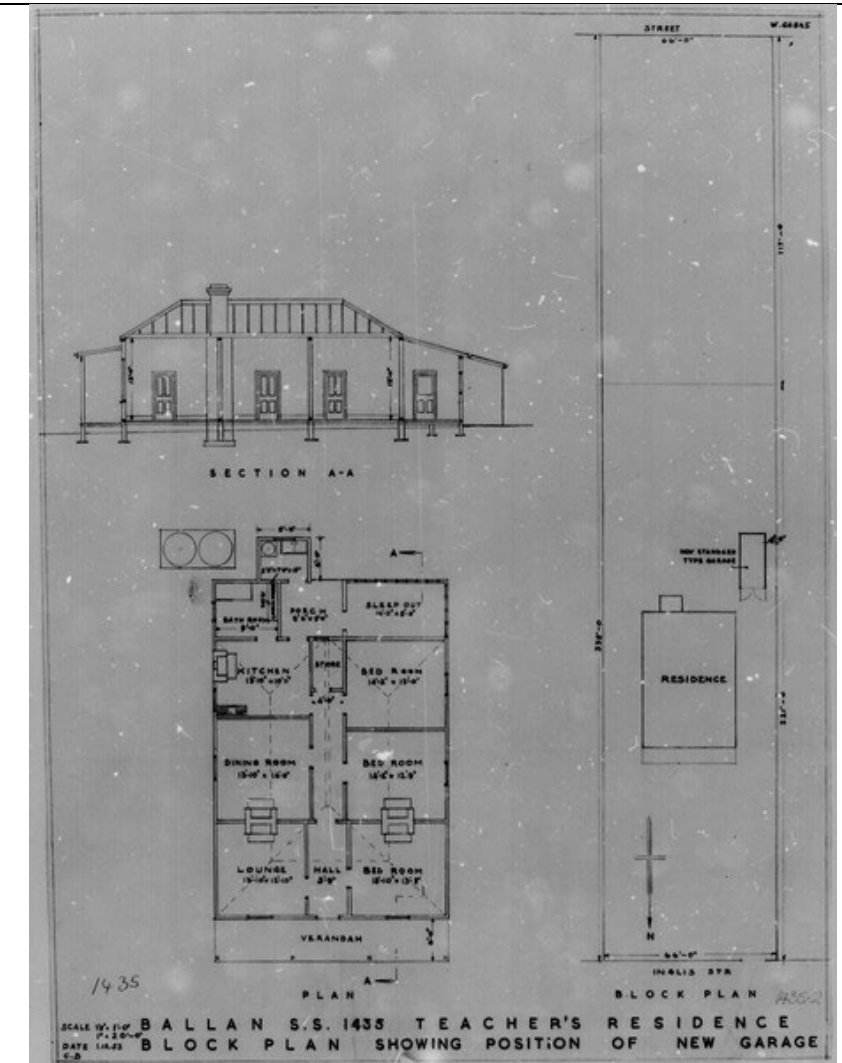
Floor plan, section A-A and block plan of Everleigh, 1 October 1953.
